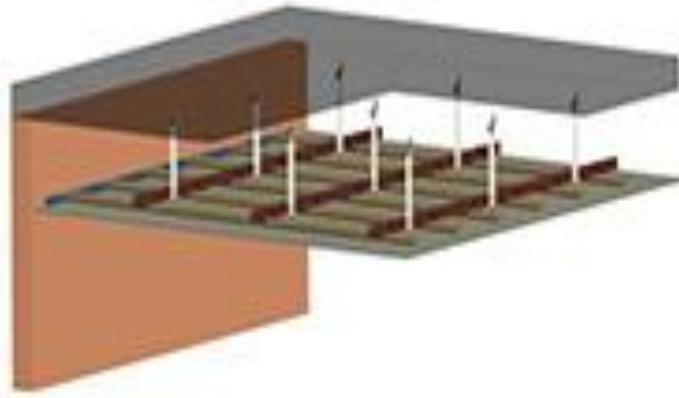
The gypsum plasterboard false ceiling system (Gyproc n.d.).
